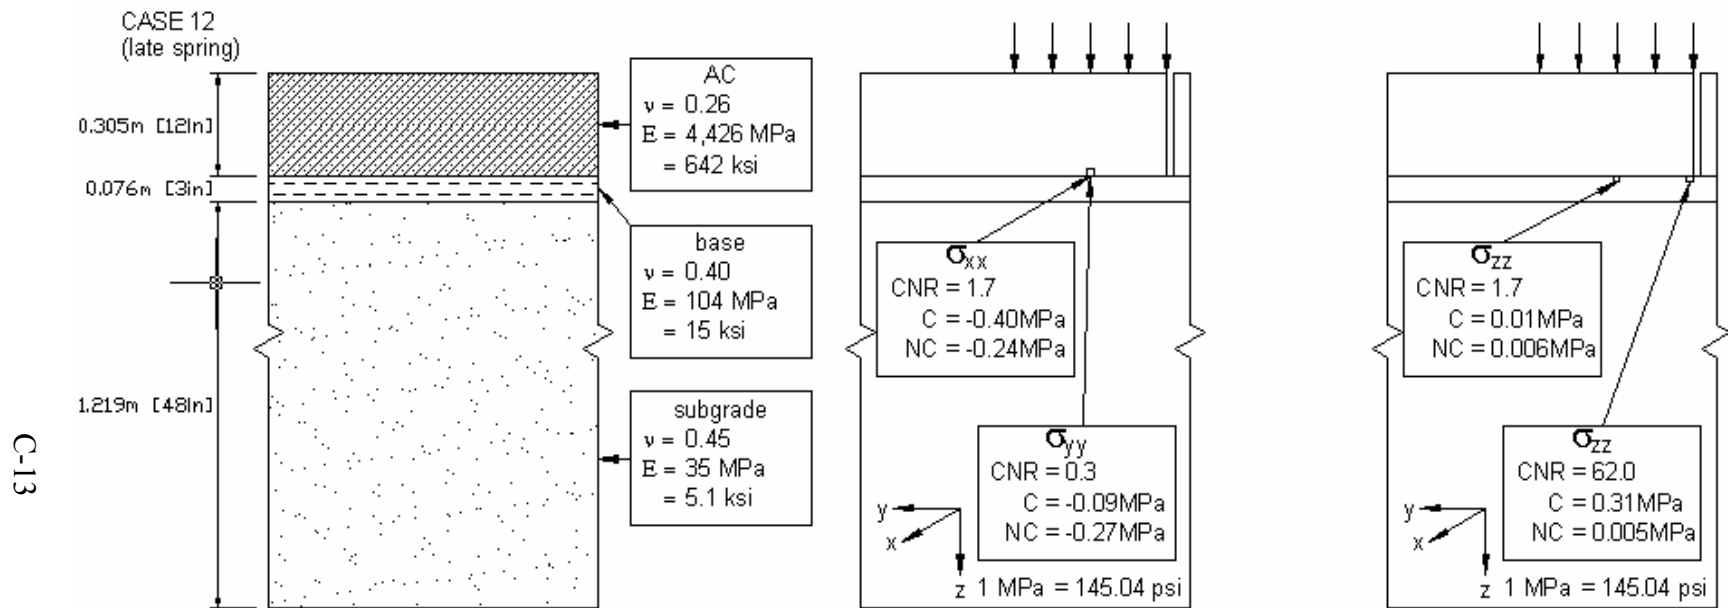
Summary cross section for case 12, (C – stress in cracked pavement, NC – stress in pavement with no crack, CNR – crack/no crack (stress) ratio)
